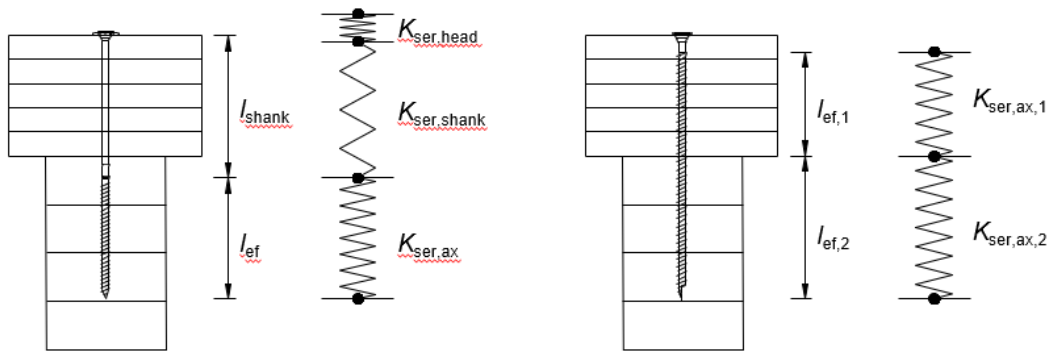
serial spring model to determine the total axial slip modulus $K_{ser,ax,tot}$ of a timber-to-timber or wood-based product-to-timber connection; exemplary (left) for a partial thread screw and (right) for a full thread screw
